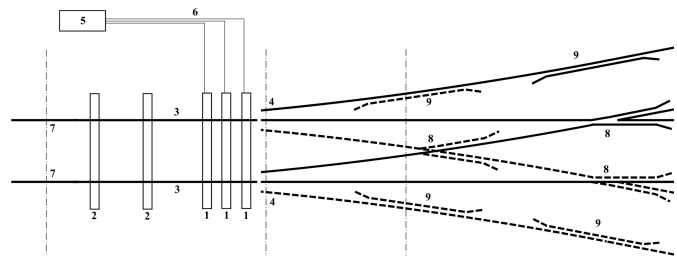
REPOINT switch layout - 1 Bearer with electro-mechanical actuator featuring integral passive locking elements; 2 Bearer with passive locking elements; 3 Stock rails; 4 Stub-switch rail ends; 5 Control unit; 6 Wired connections; 7 Straight Route; 8 Common crossing; 9 Check rails. [6]
